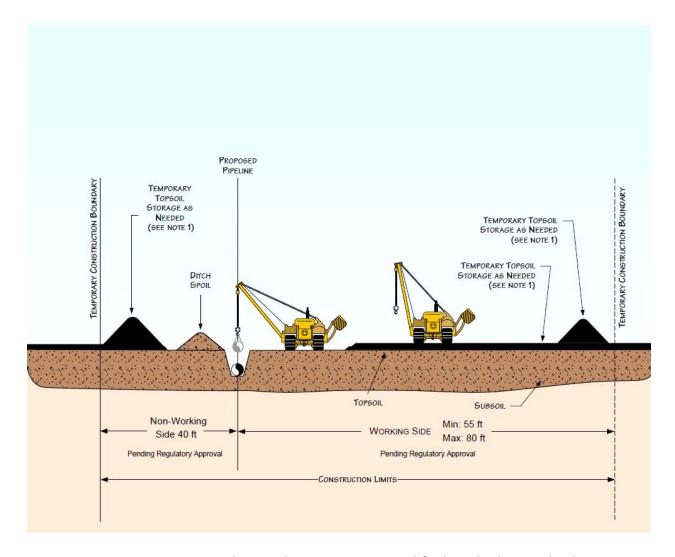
Typical Topsoil Segregation – Modified Ditch Plus Spoil Side
